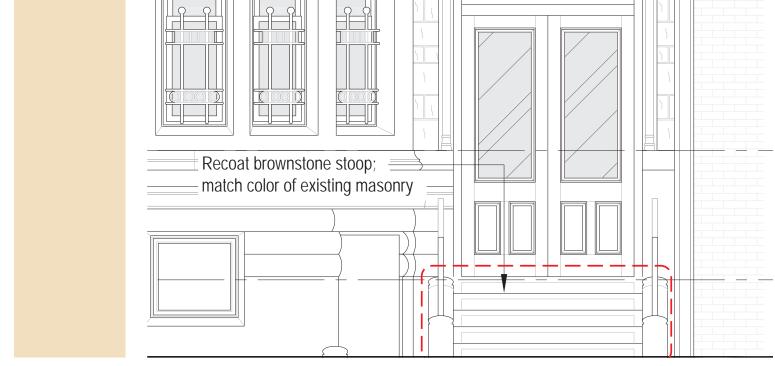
DETAIL VIEW @ EXISTING BROWNSTONE STEPS
